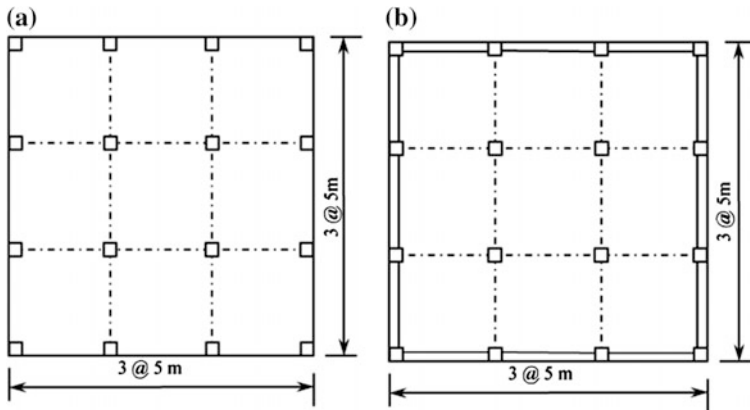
Plan of the flat slab buildings: a without edge beams; b with edge beams
